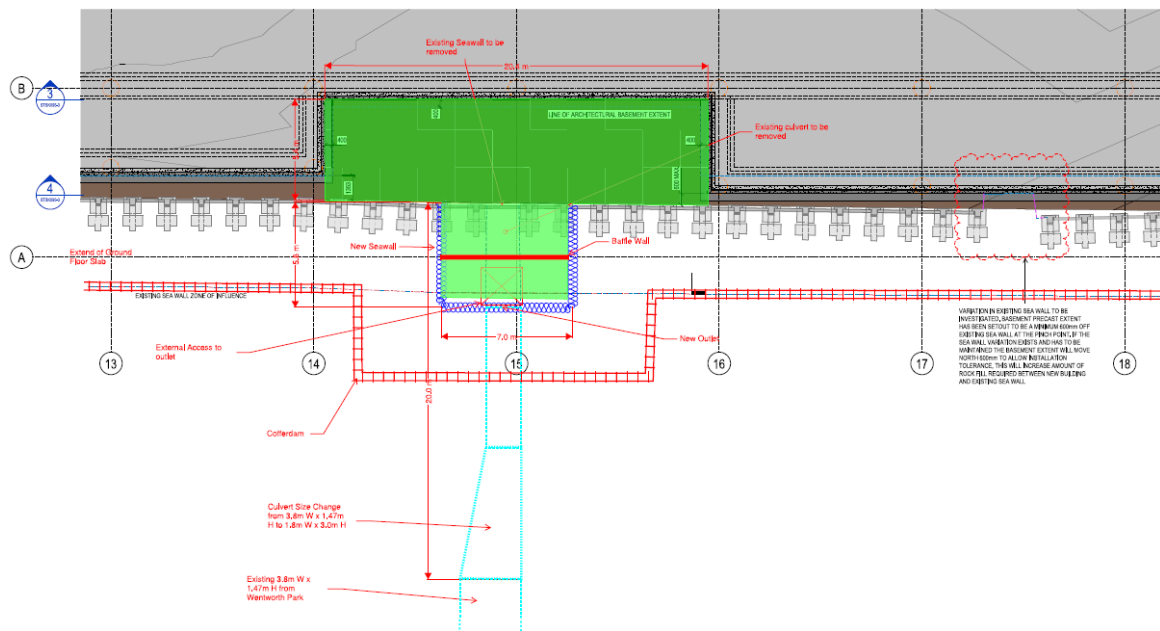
Plan View for Stormwater Culvert 2 (Central)
